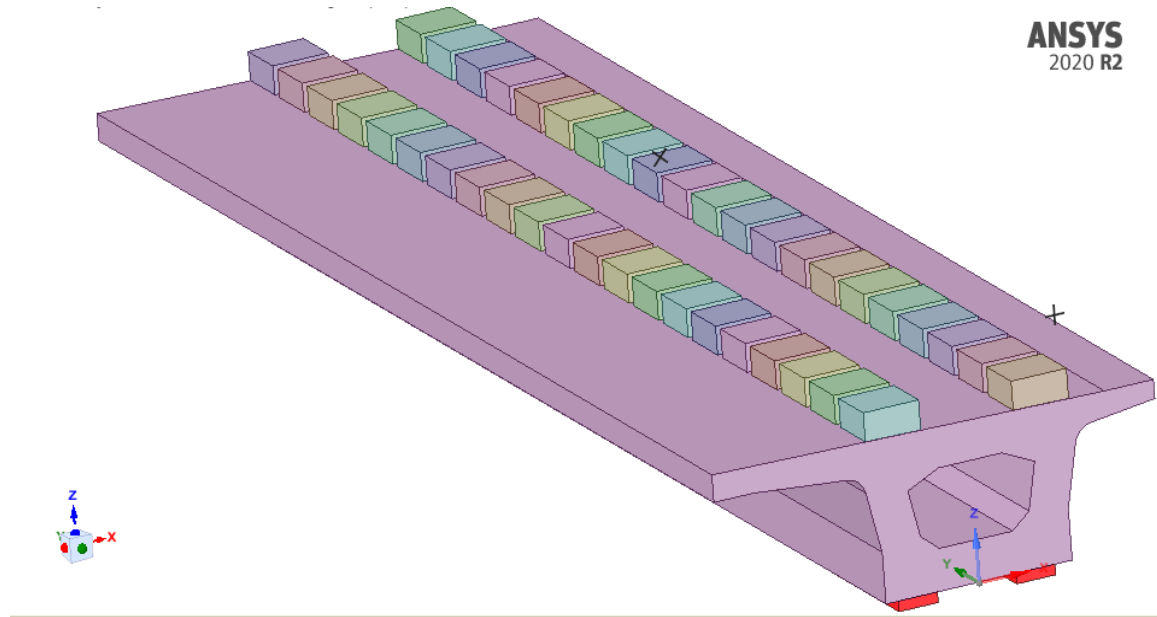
Pre-stressed Concrete Box Girder with Box Sleeper Modeling
